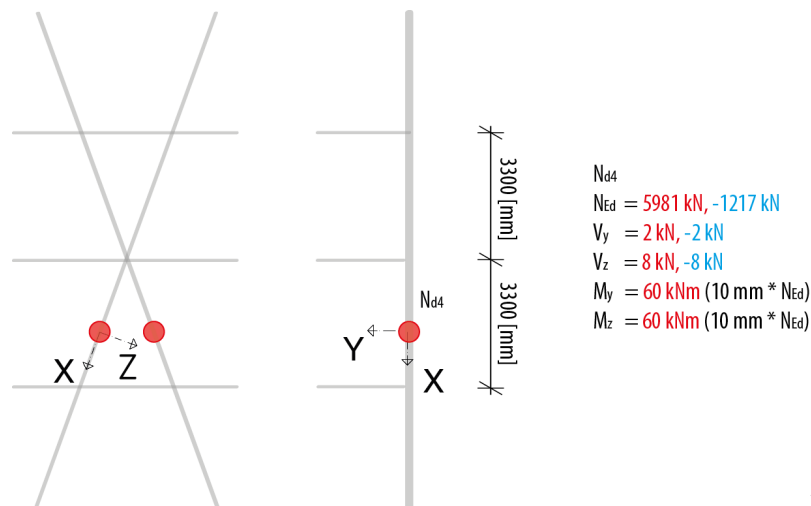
Detail 4, normative load prefab element connection (Local coordinate system). Moments are generated by construction tolerances
